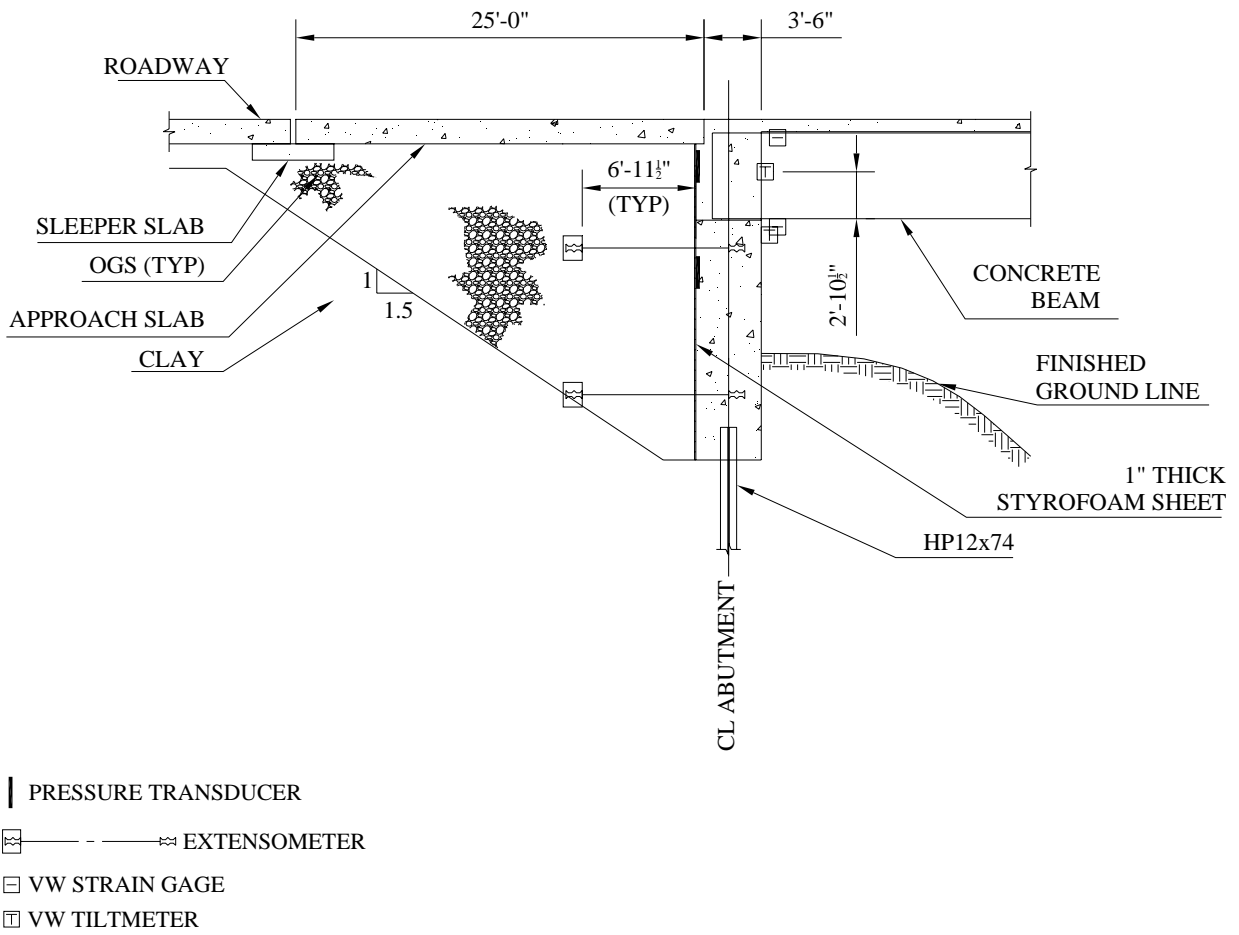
Structure 203 Cross-Section Through Abutment 2 (Section A-A).
